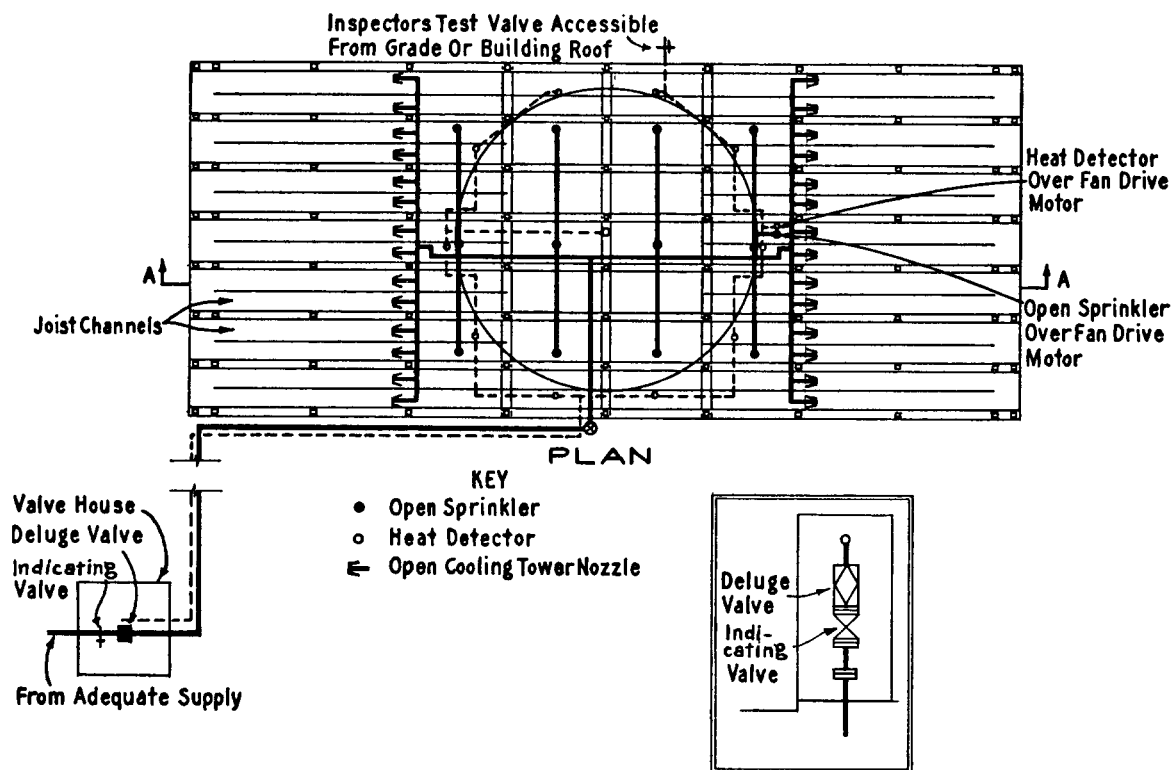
Typical deluge fire protection arrangement for crossflow towers.
